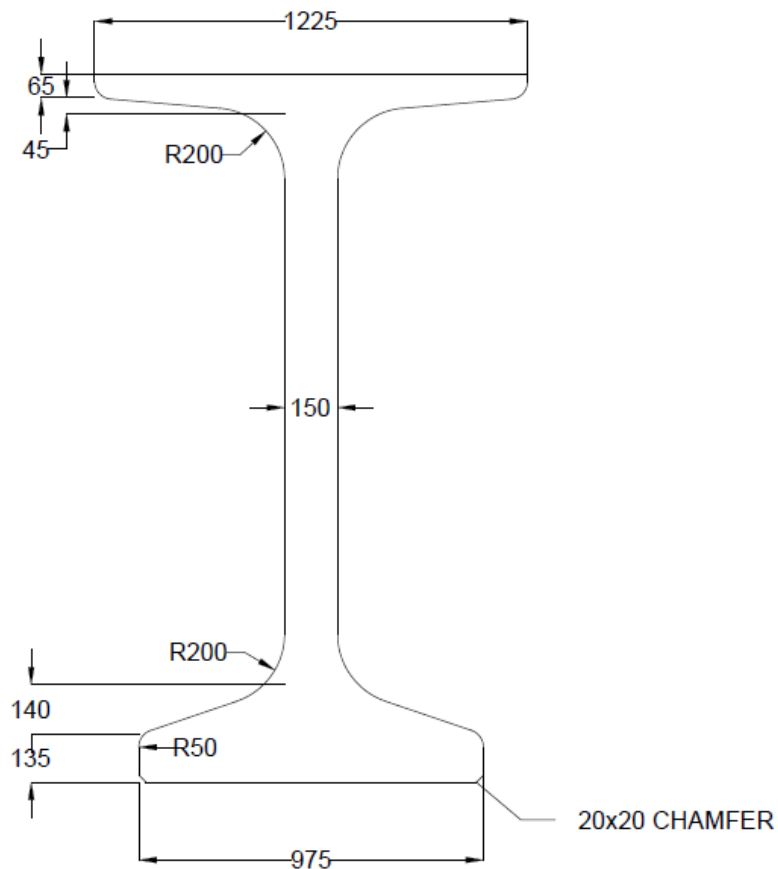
Standard NU 2000 Girder Section Used for Girder Section G3
